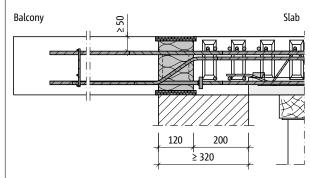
Schöck Isokorb[®] XT type C: Prefabricated slab with edge support with thermal insulating masonry (section XT type C-R-CV50, view XT type C-L-CV35)
